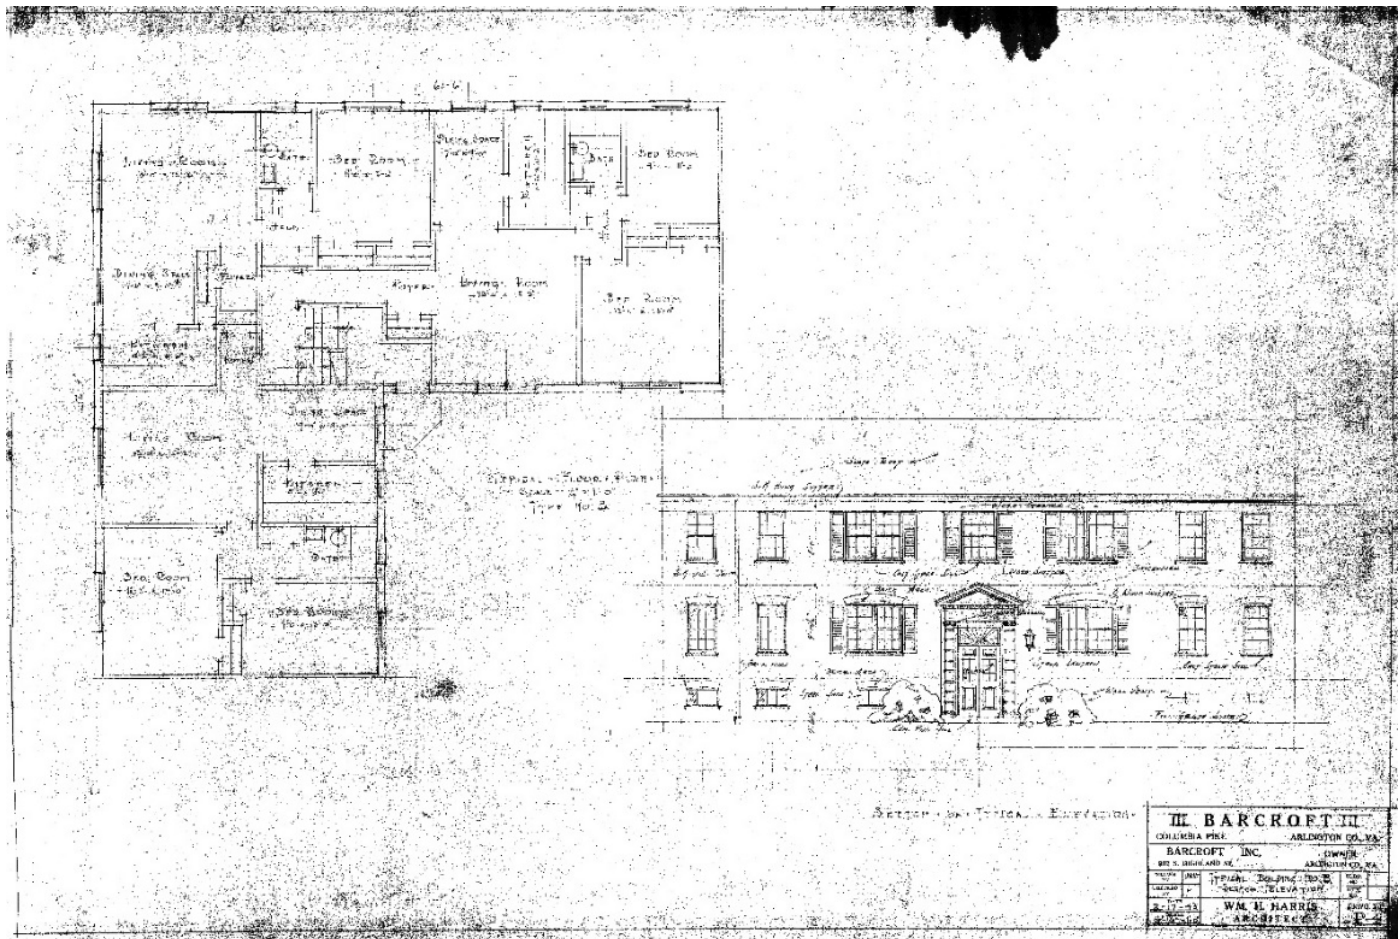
Barcroft Apartments, Section 3 Building 2, Sketch of Typical Elevation, February 17, 1943 by William H. Harris (Barcroft Apartments Archives)
